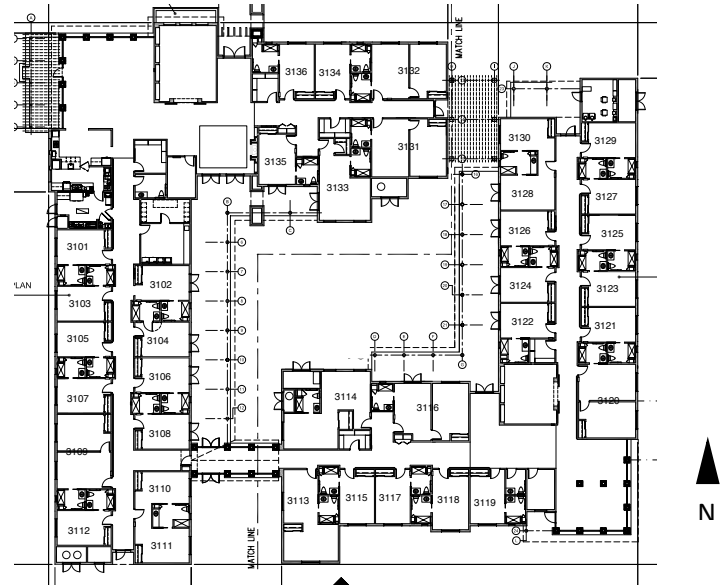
Building Plan of Assisted Living Facility in the Southwestern U.S.
